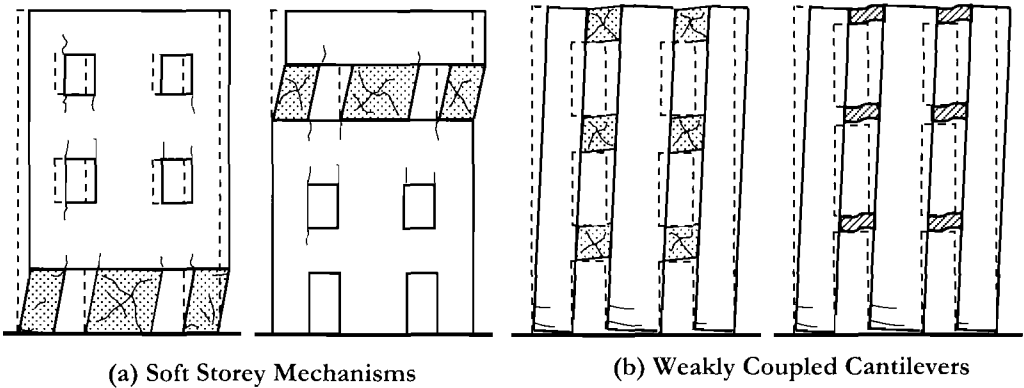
Possible Failure Mechanisms of Coupled Masonry Walls
